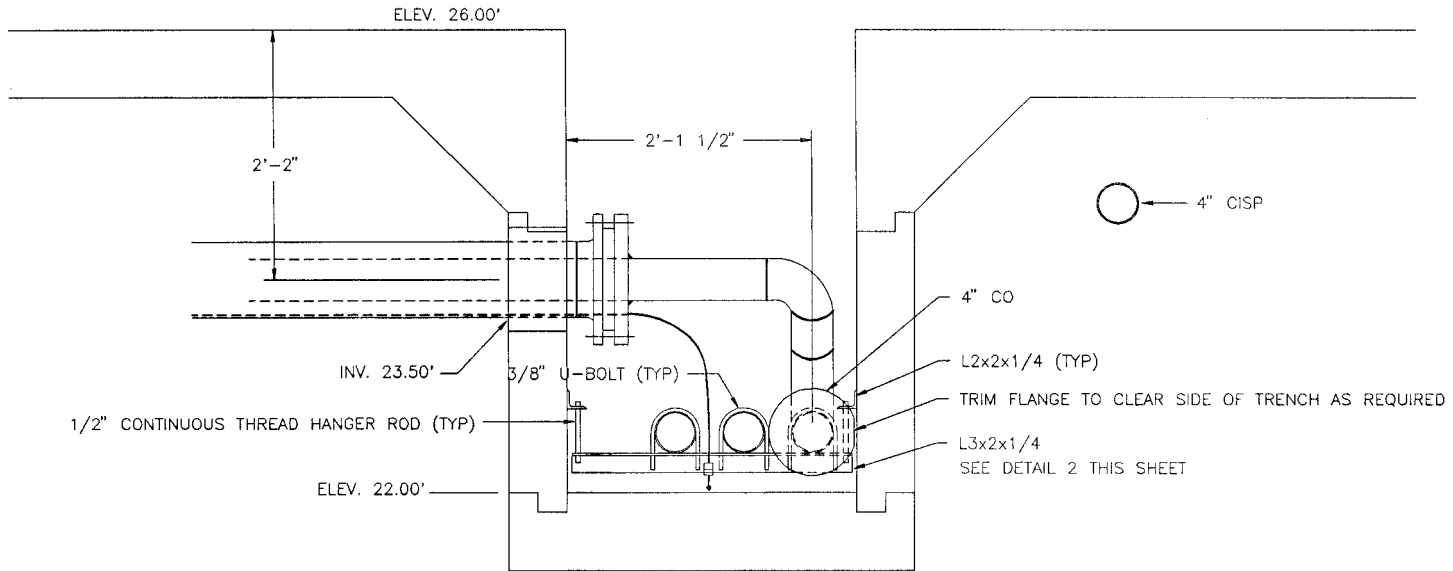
An example of single-wall underground chemical waste headers housed inside of a coated secondary containment concrete trench in a chemical weapons testing and research facility for the U.S. Army Corps. of Engineers. (Poole & Kent Co.). (From "Handbook of Double Containment Piping Systems," C. Ziu, McGraw-Hill, New York, 1995.)
